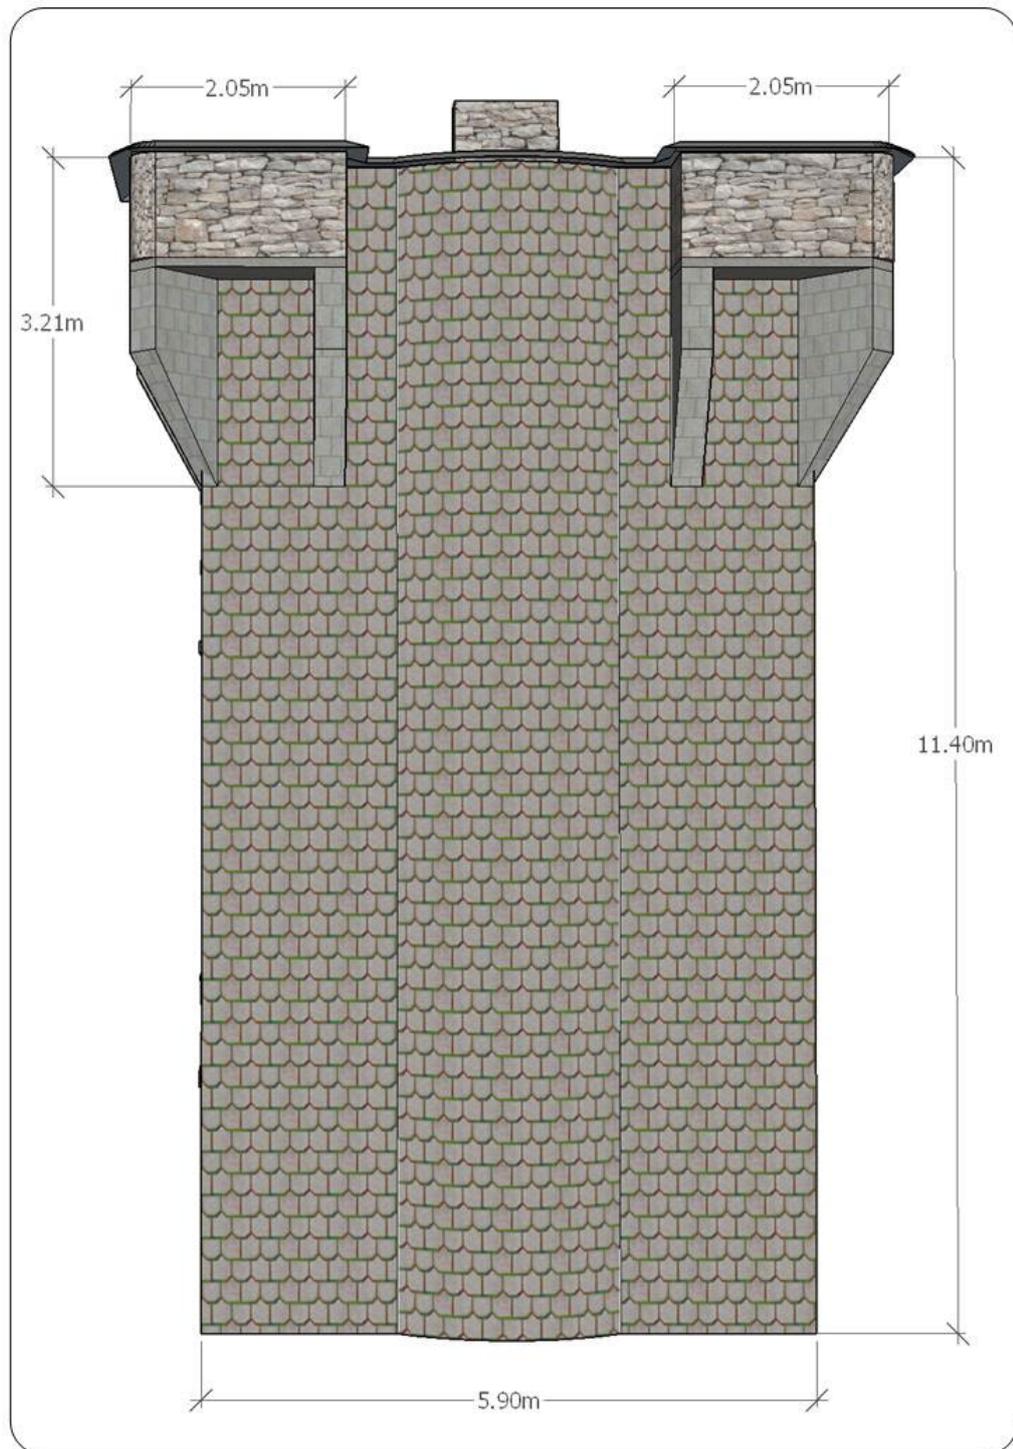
Rendered 3D model for an idealised tower showing rear wall elevation with chimney flue, chimney stack and bartizans.
